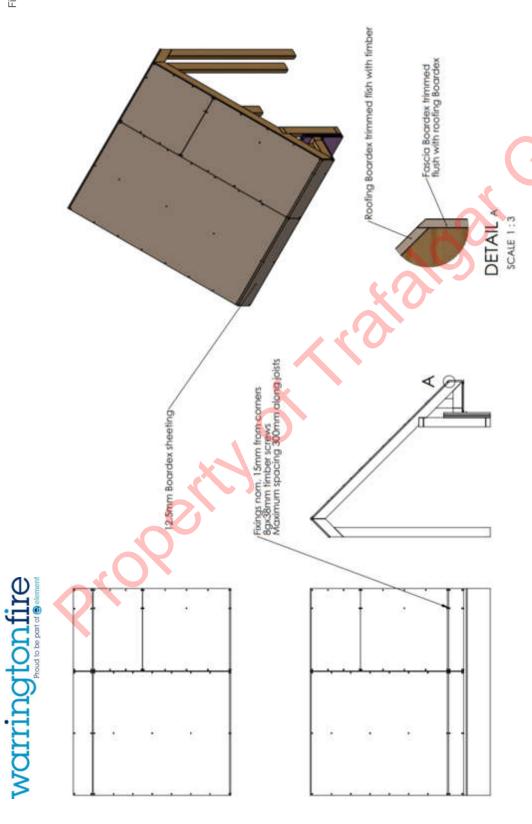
Plan view showing fixing centres for Trafalgar Fire BoardeX fascia
